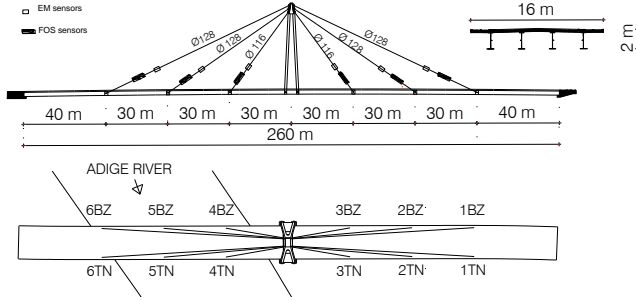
Longitudinal section of the bridge and sensor layout (upper); plan view of the bridge (lower).
